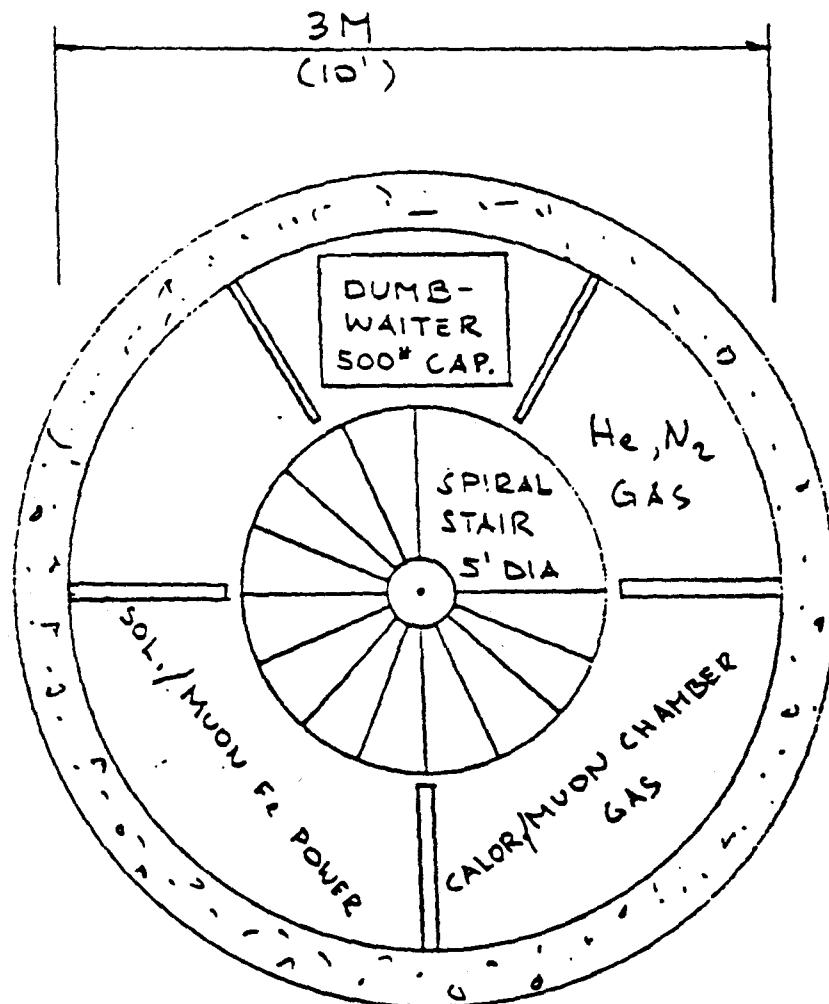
Cross-sections of Personnel and Equipment Shafts
